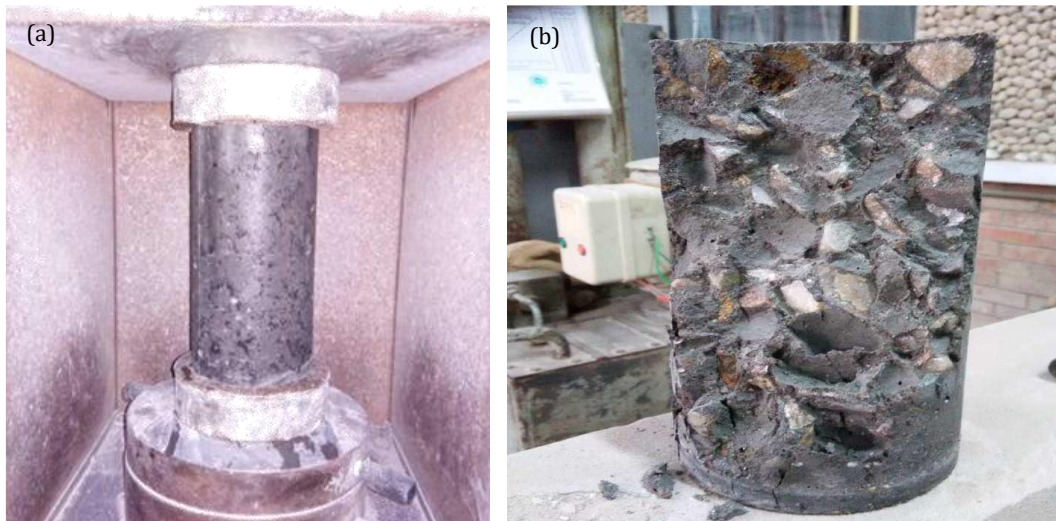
Concrete specimen testing: (a) During test; (b) After failure.
